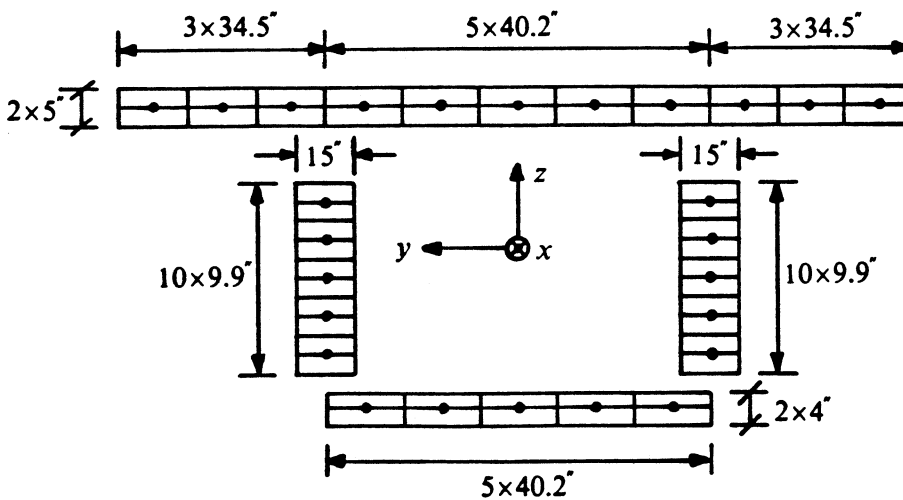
EXAMPLE 8.2 - ELEMENT SUBDIVISION
